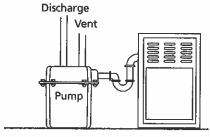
Typical installation to remove air conditioner condensate or dehumidifier water
